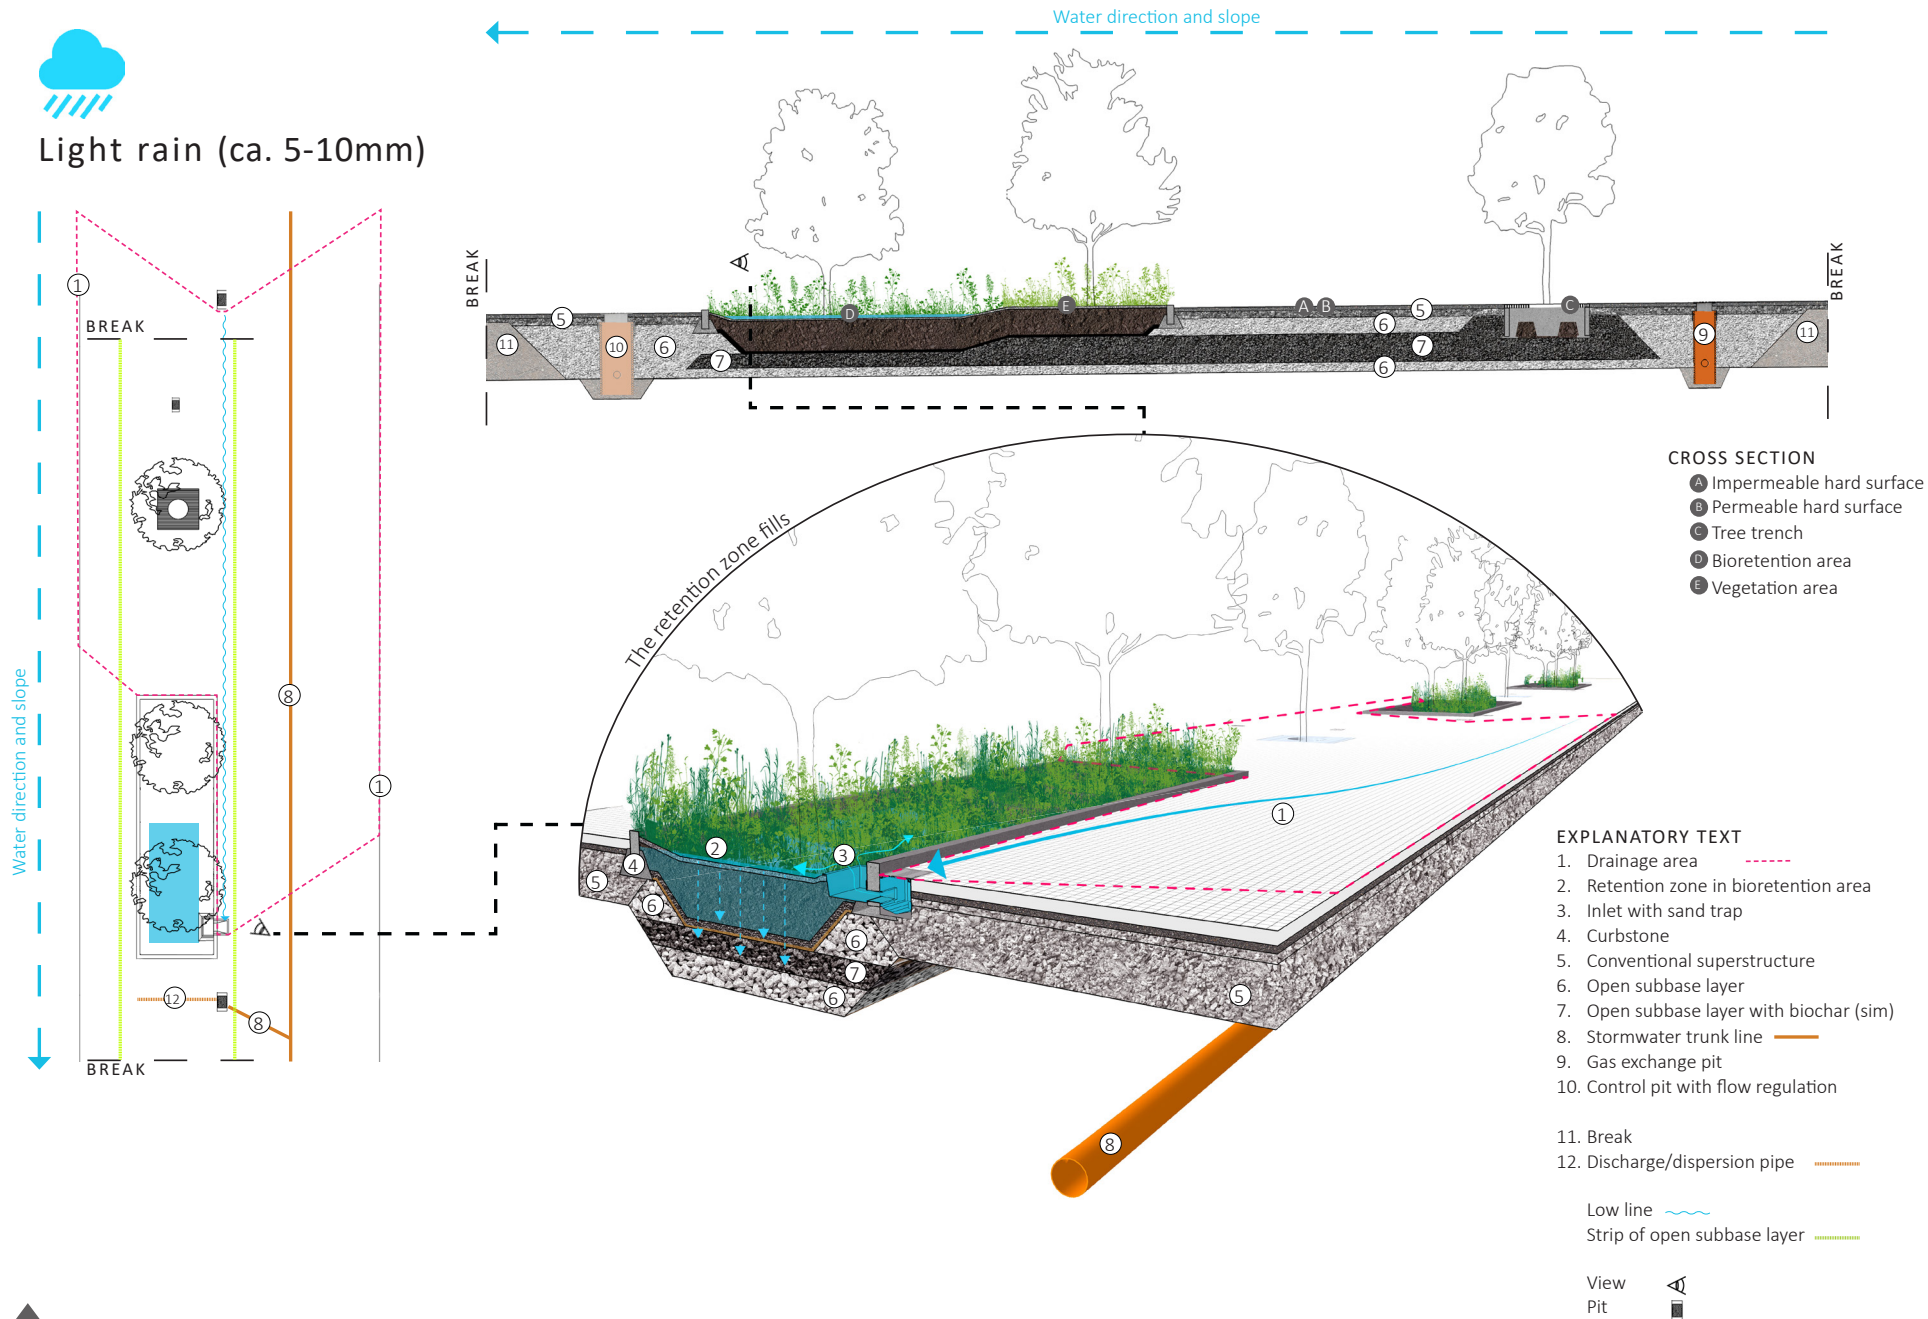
Illustration of water flow during light rain in a BGG system with bioretention construction. In case of lesser rain, stormwater runs to the bioretention area and infiltrates the open subbase layer. Plan view (left), longitudinal cross section (above), three-dimensional view (below).
